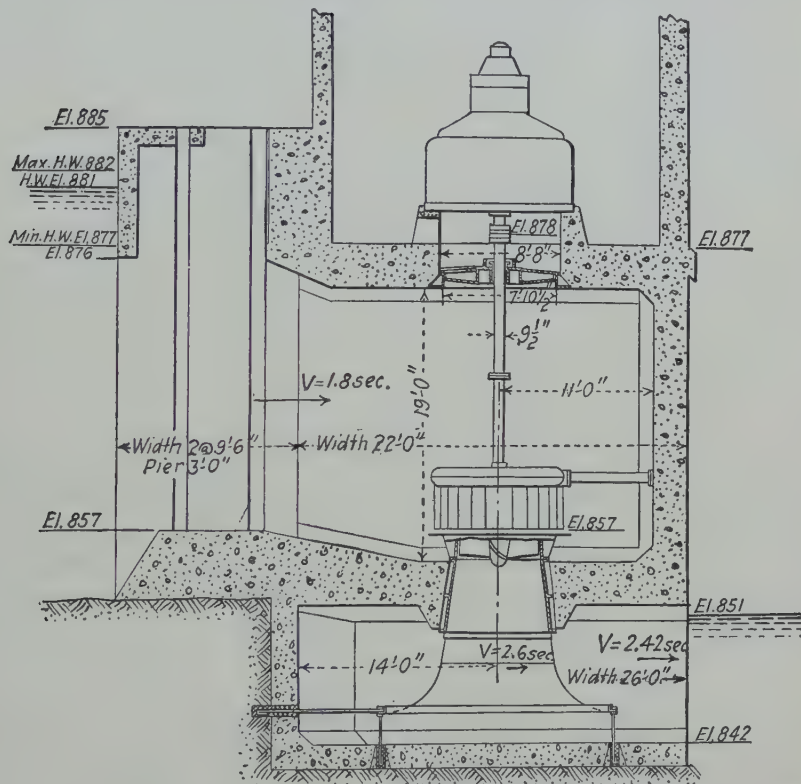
Open wheel-pit turbine setting—preliminary plan 1550 hp., 30 ft. head, 225 or 257 r.p.m. (Allis-Chalmers Manufacturing Company.)
